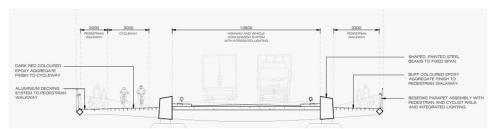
Excerpt from the applicant drawings showing cycle lanes at the north end of the SPAR bridge (Source: Dwg. No. MOXON-SBR-SP-DR-A-100-00020)
